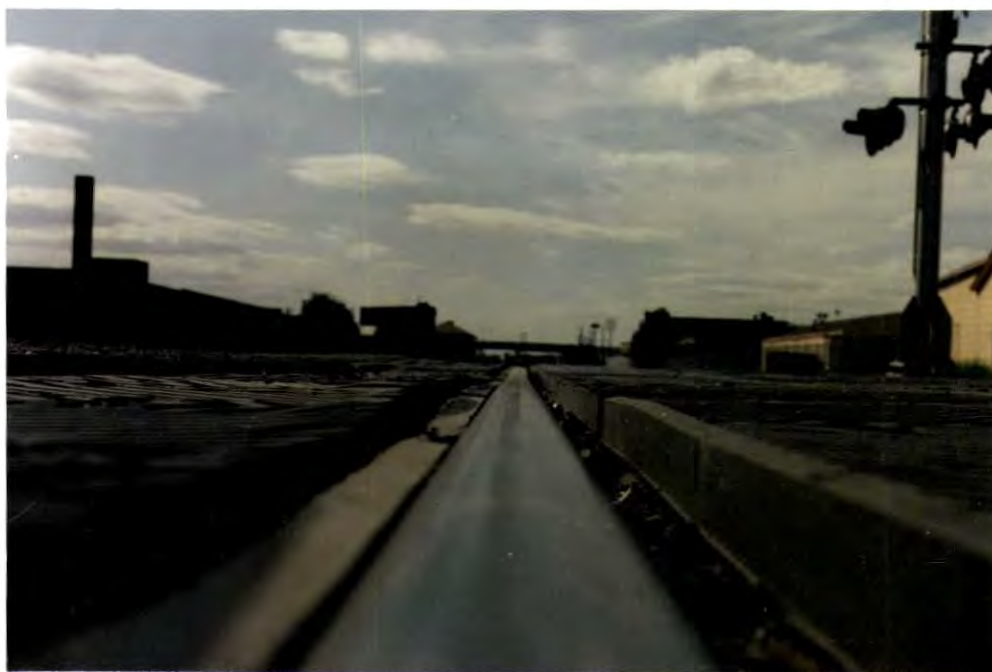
Kline Street - Panel Distortion and Track Settlement.
